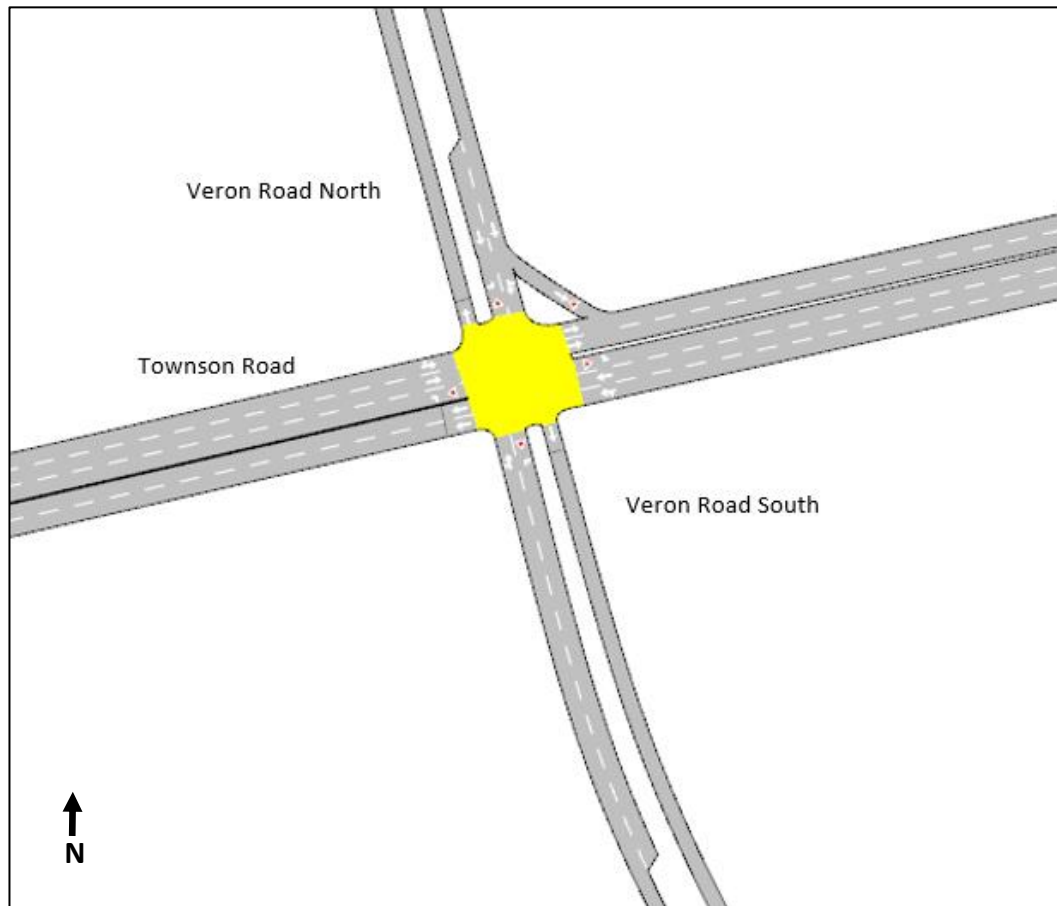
Revised intersection layout at Townson Road and Veron Road
